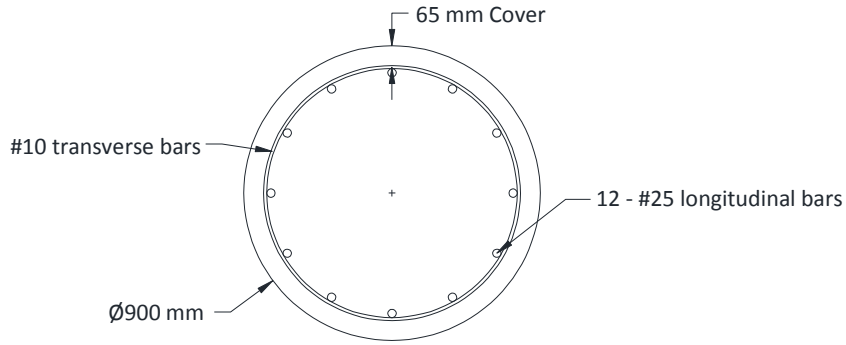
Cross sectional view of 900 mm diameter bridge pier
